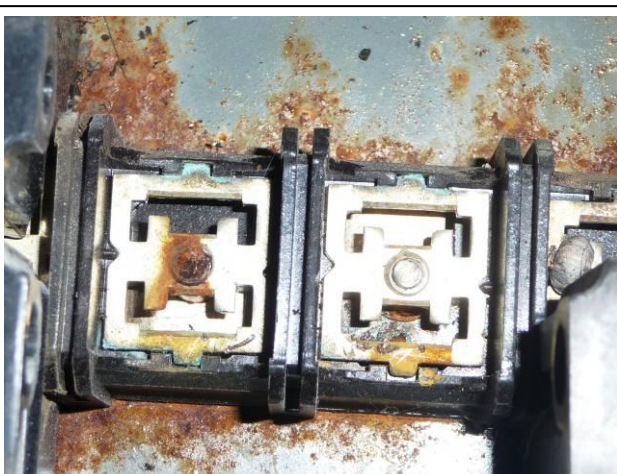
Close-Up of Corrosion and “Burn” Marks on a Stab-lok Panel
